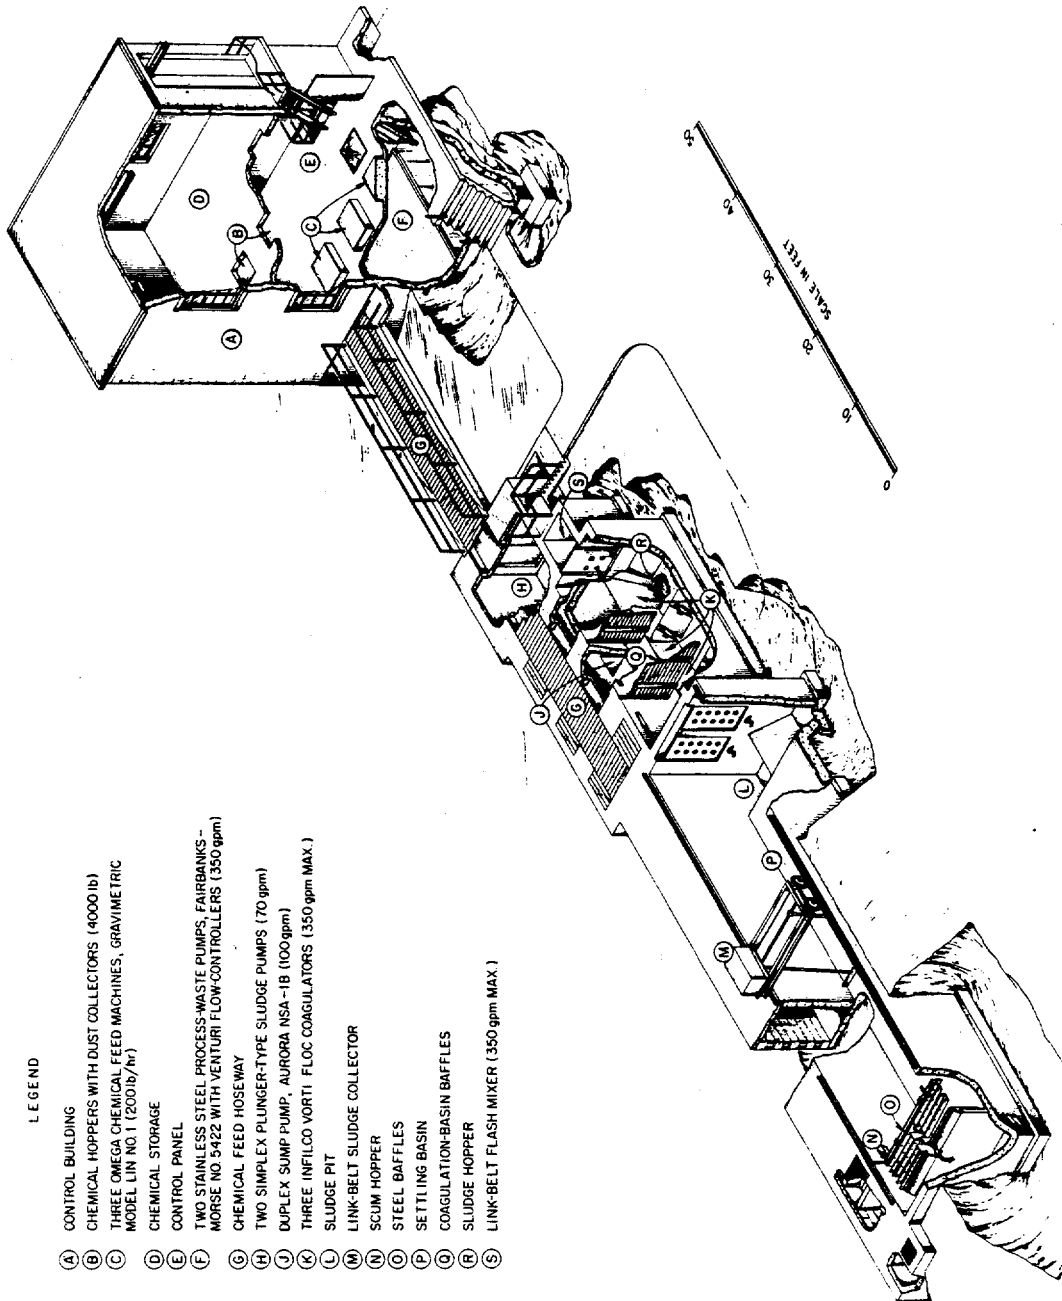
Process Waste Treatment Plant, Building 3518
